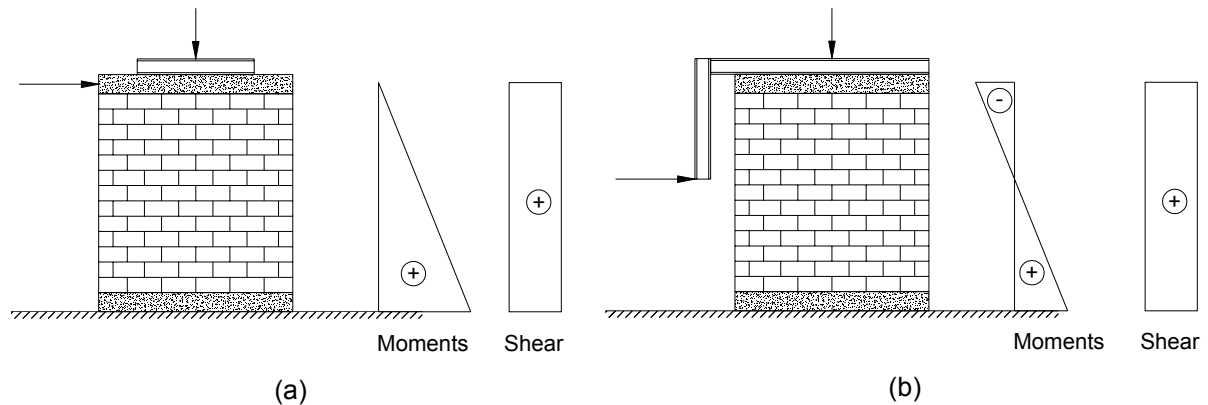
Different boundary conditions of shear walls: (a) cantilever (b) non-cantilever.
